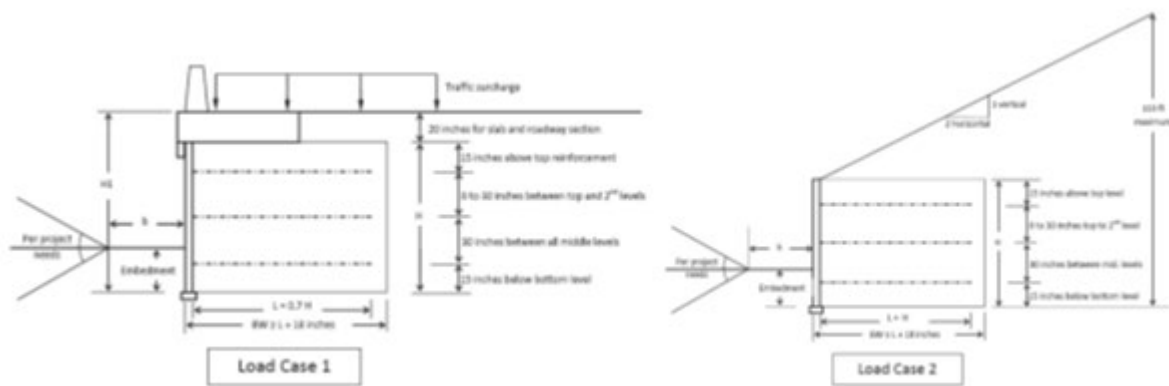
Reinforcement Layout (Bridge Design Aids 3-8, 2013 - Attachment 1)
